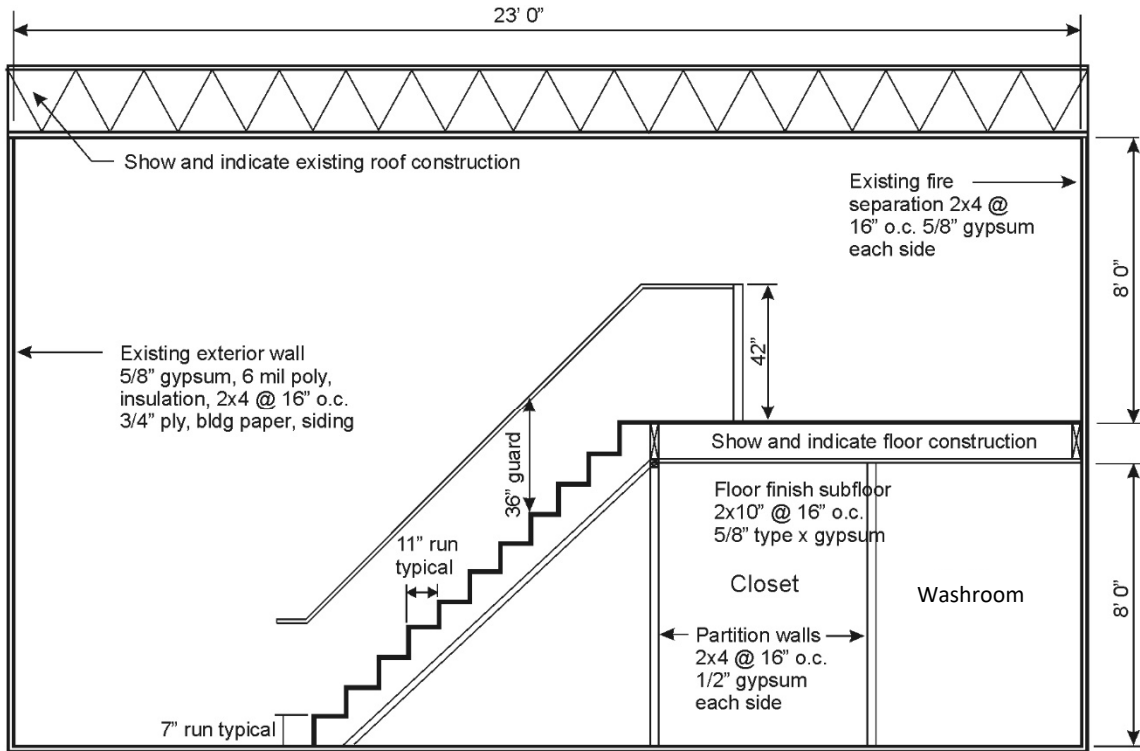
Cross Section A-A (to be 1/4" = 1'-0")
